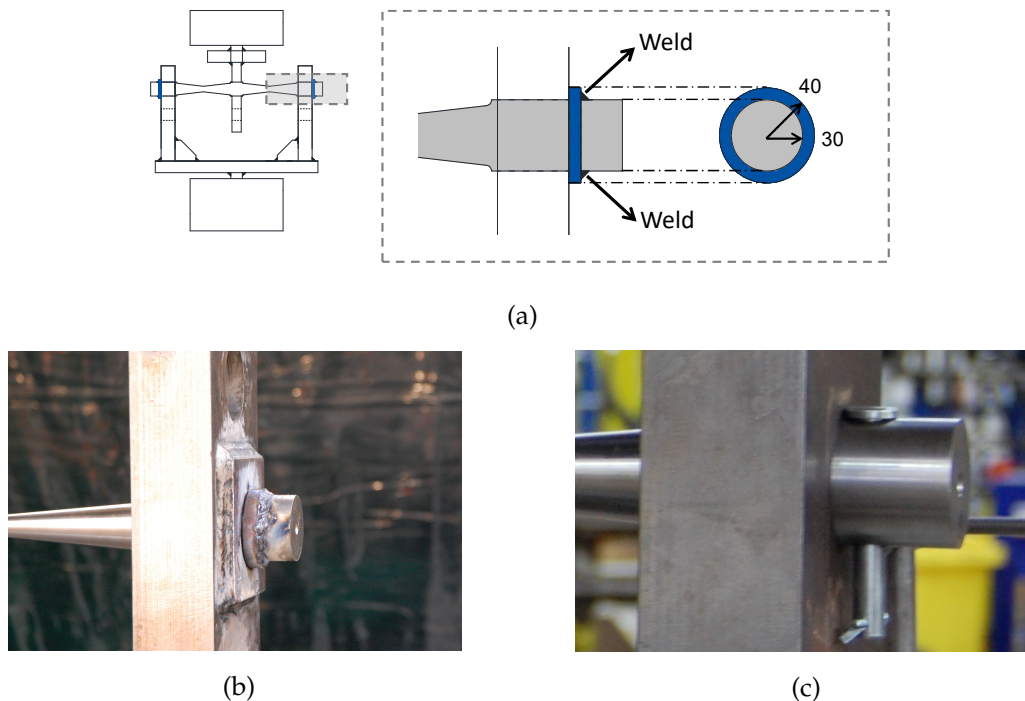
SSP axial constraint: (a) steel collar geometry for SSP1 (all dimensions in mm); (b) collar welded onto SSP2 with additional steel plate; and (c) 12-mm diameter clevis pin used in first test on SSP2
